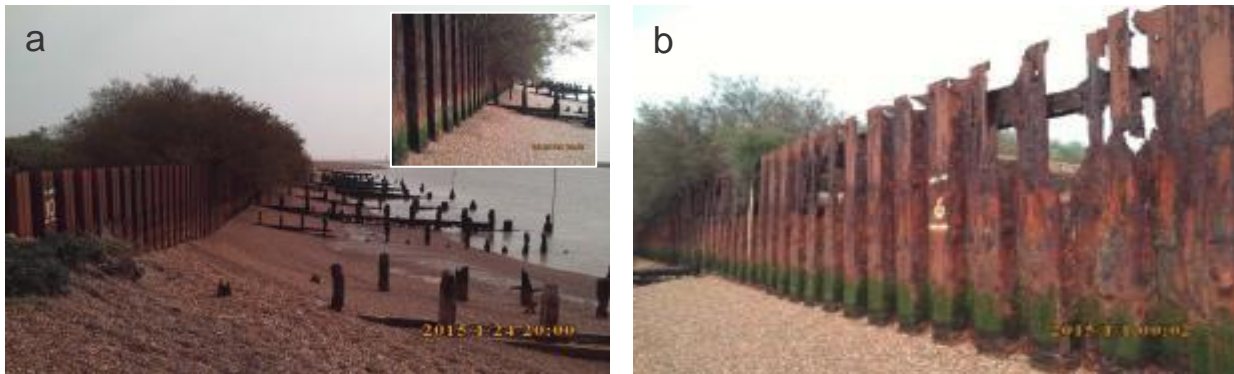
Bawdsey Quay Steel Sheet Pile Wall - a) Northern section, b) Central section
